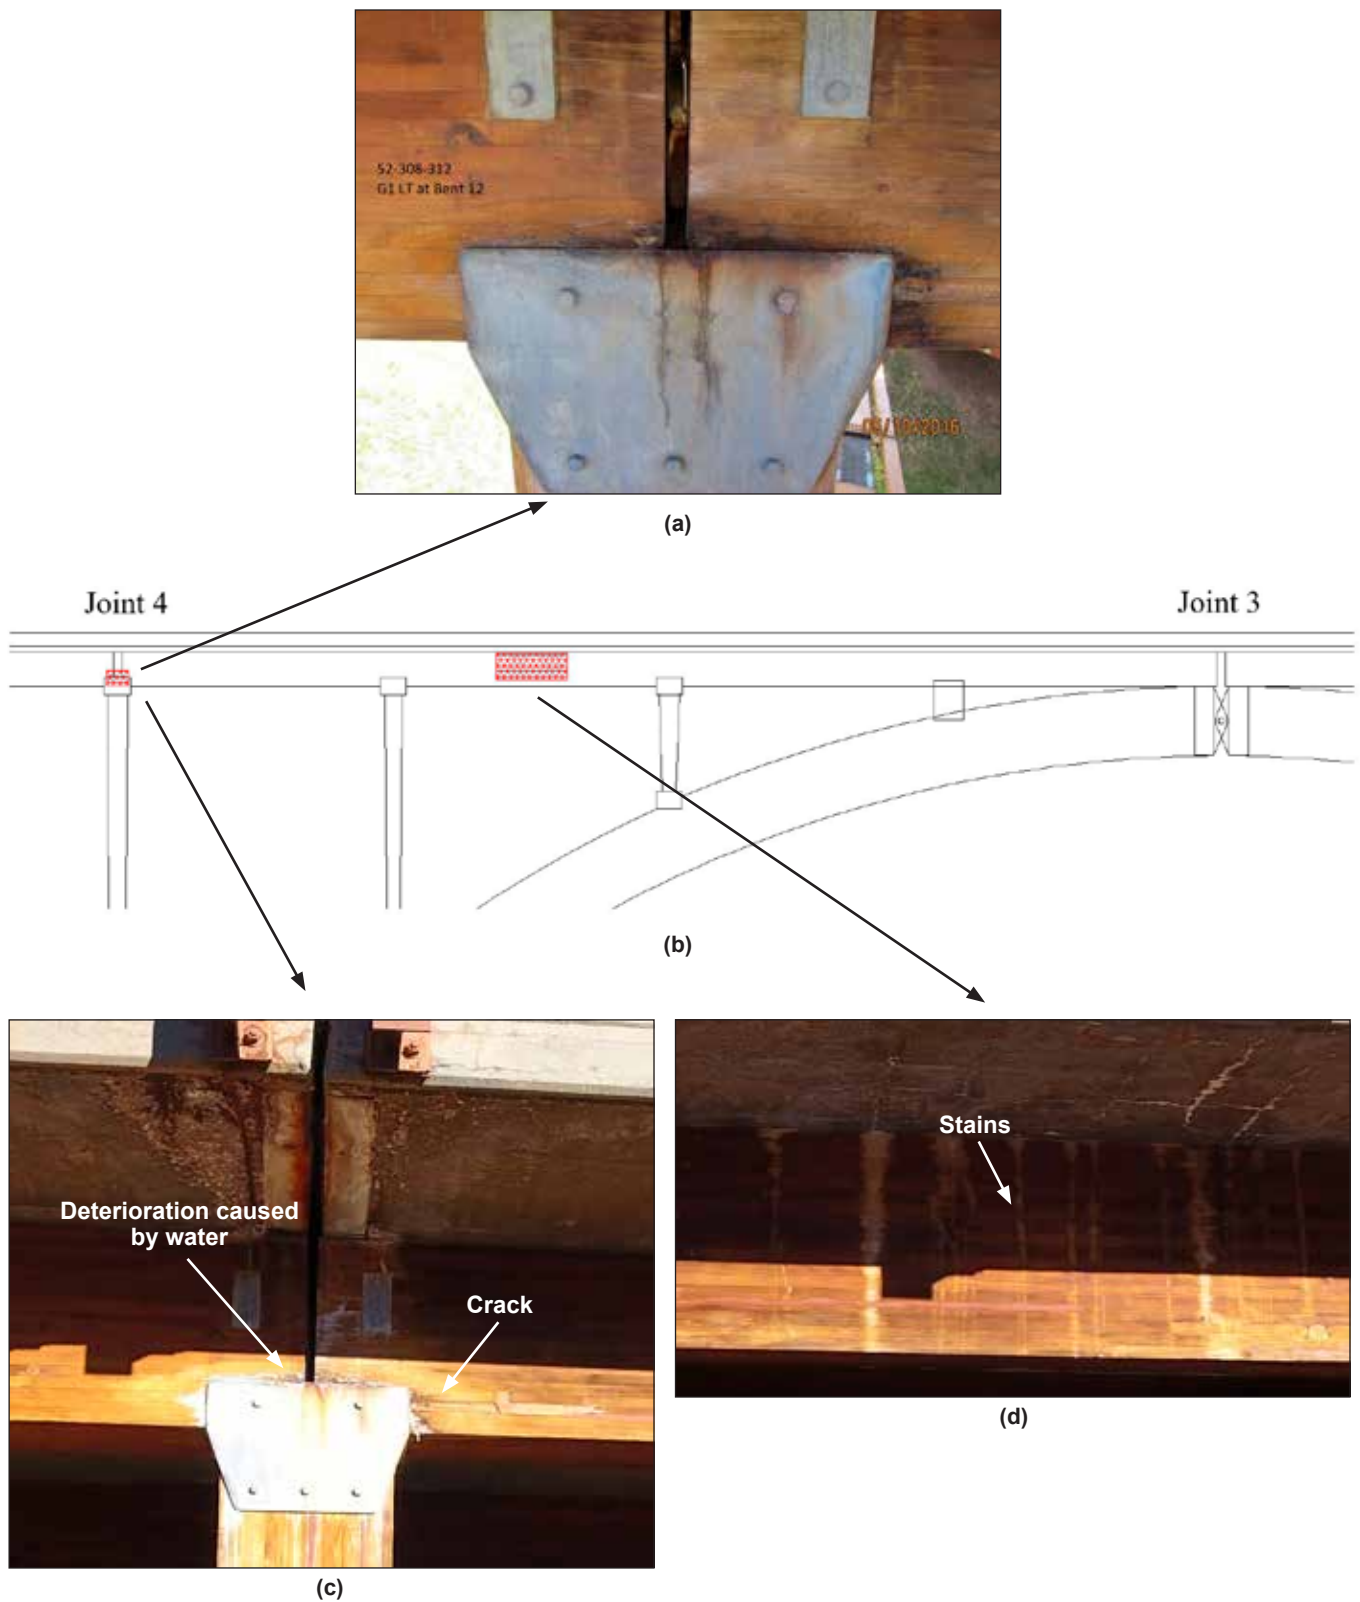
Sample damage on Stringer 1: (a) reference image taken during conventional inspection (used with permission from South Dakota Department of Transportation); (b) damage location; (c) shear crack and deterioration caused by water on Stringer 1 at Joint 4; (d) stains on Stringer 1 between Joints 3 and 4.
